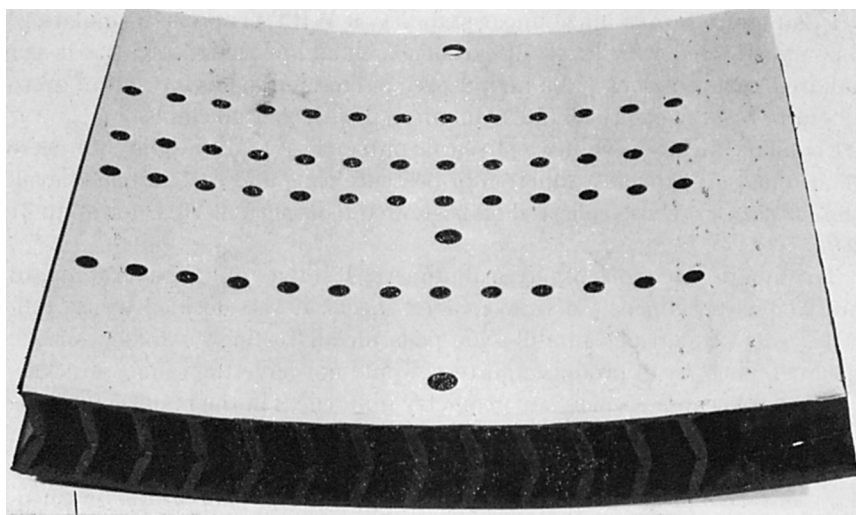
Full-scale neoprene pad and specimen made by sectioning a pad.
